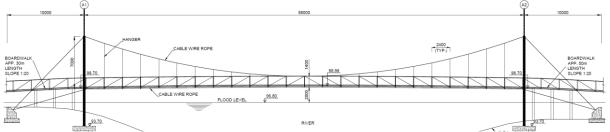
Murray River adventure trail section 09 Deep Creek Bridge – Bridge design. Drawing No. – JJR-4211023D-9-BR001. Issue – A. Dated – 03.05.2022. Drafted by – R. ABBASI. JJ Ryan Consulting Pty Ltd.
